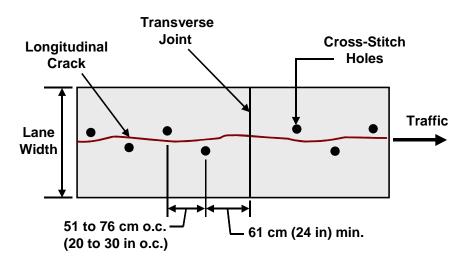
Schematic of cross-stitch tiebar installation (ACPA 2001a).
